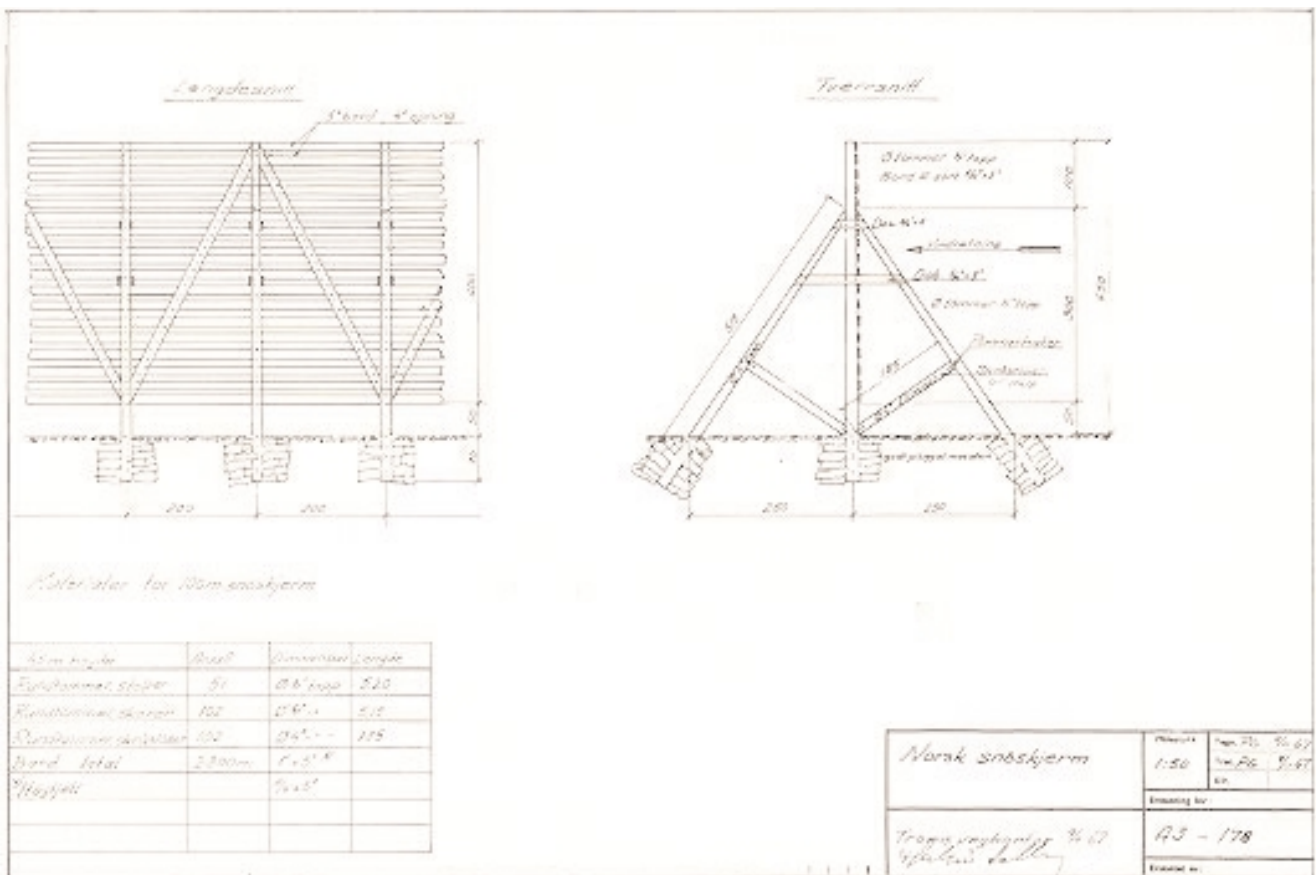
Typical wooden snow fence. Old drawing, but still the most common type used in Troms
